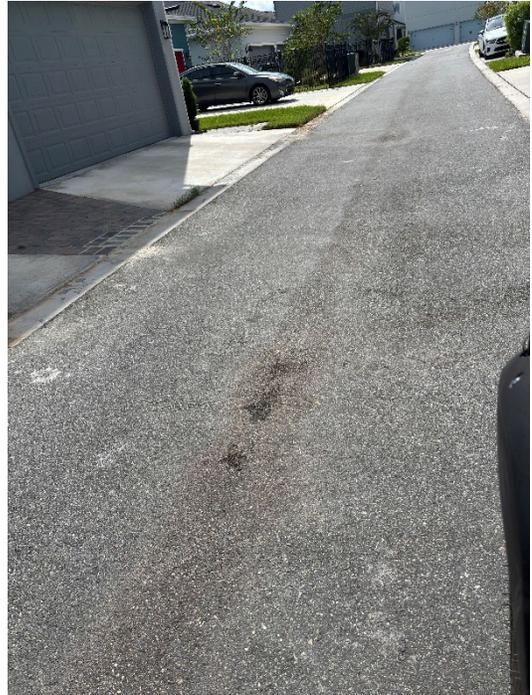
Laggett Alley–Asphalt Damage
